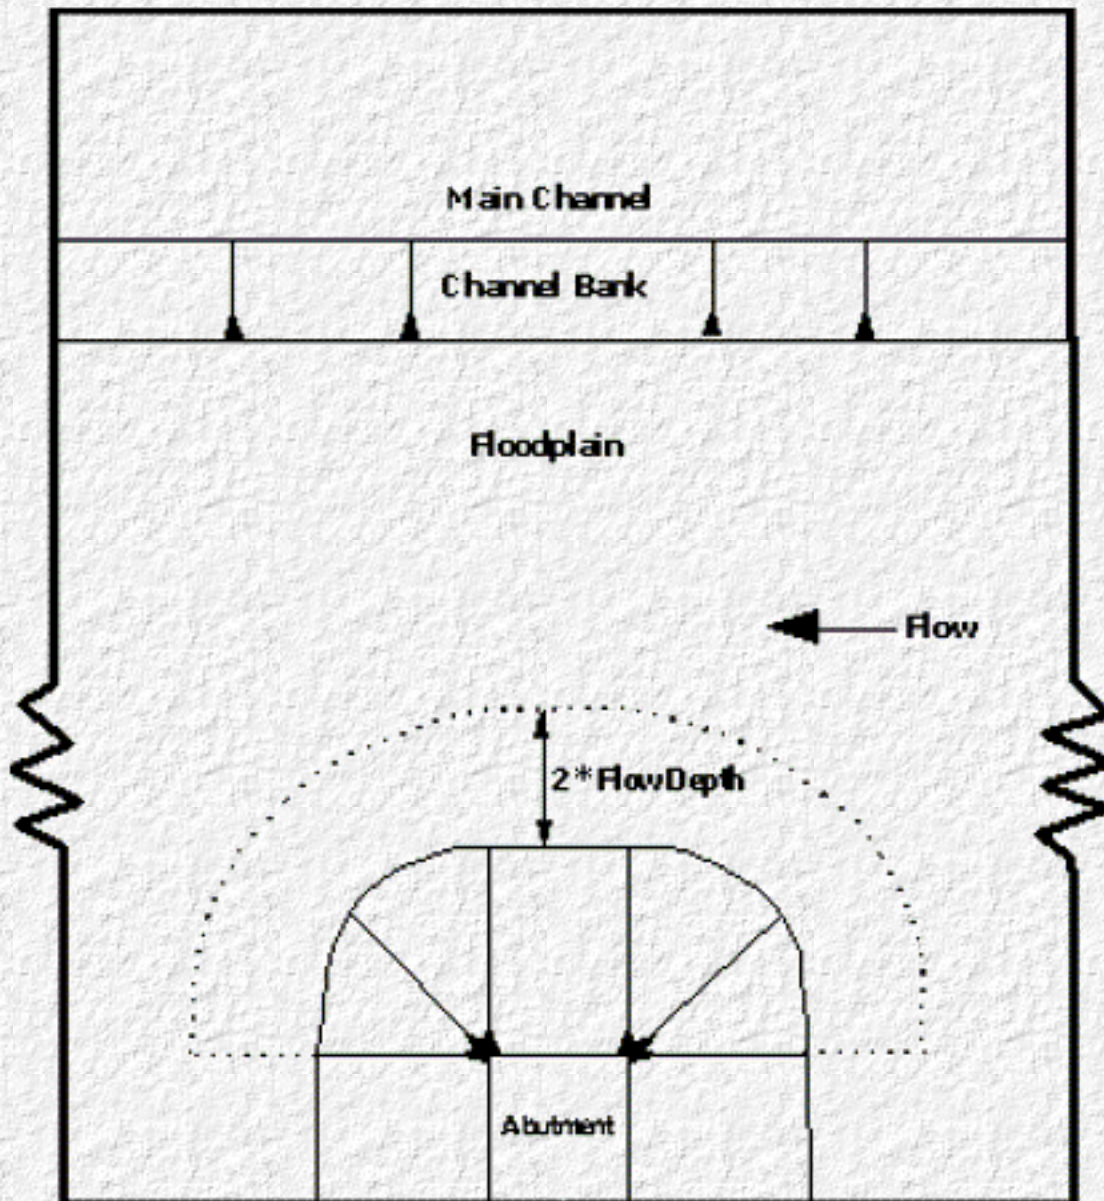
Plan View of the Extension of Rock Riprap Apron
